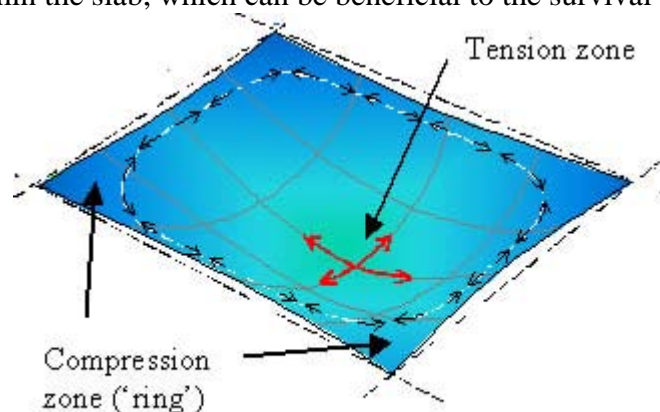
Membrane action of a floor slab with no horizontal restraint around its perimeter.
